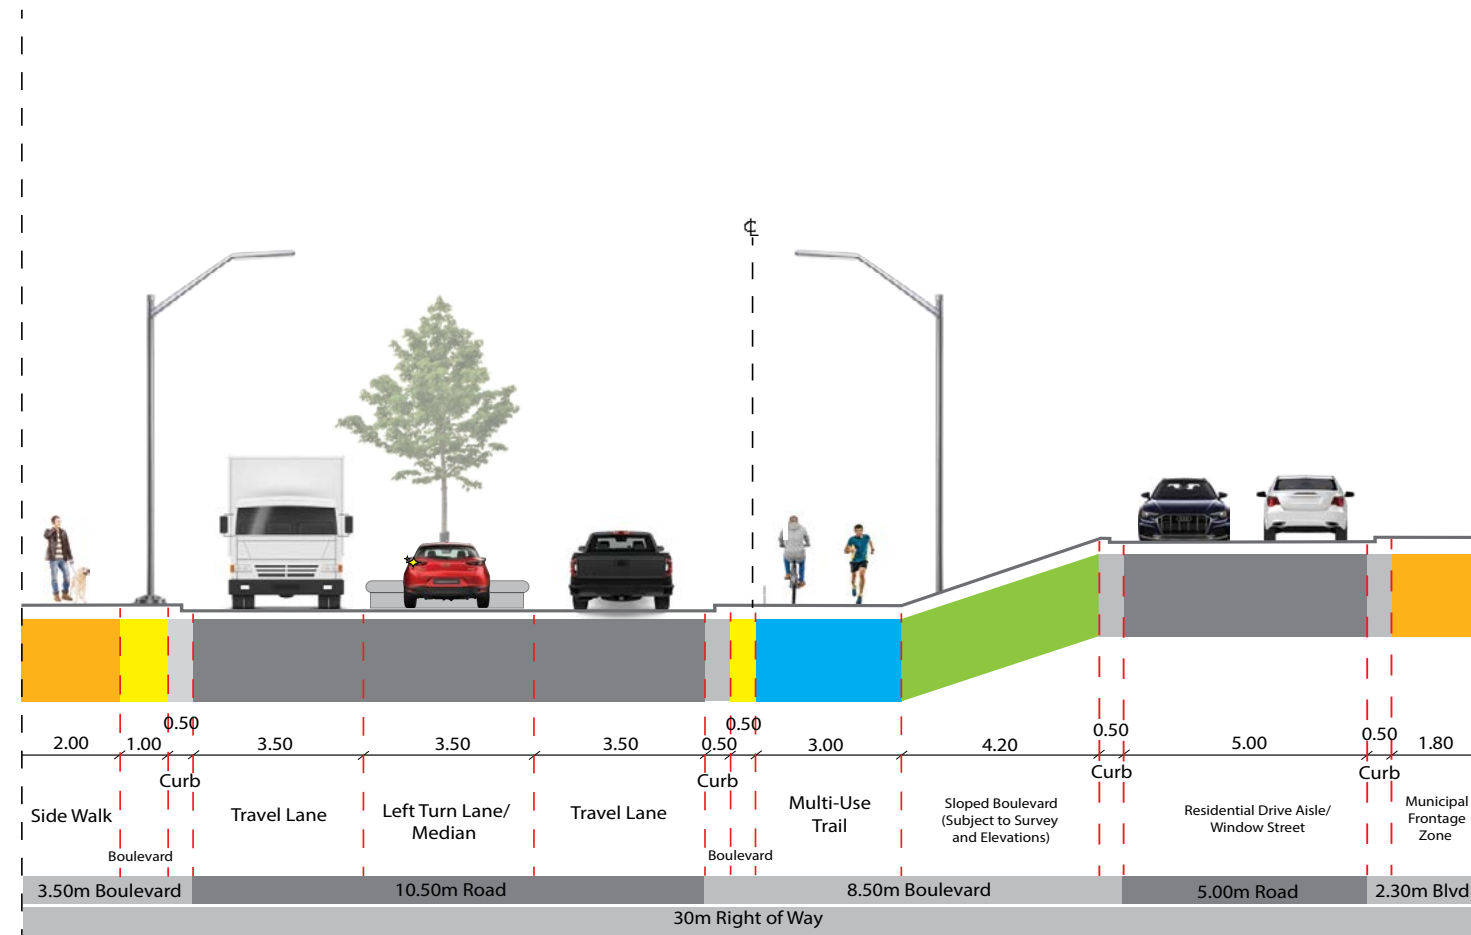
West Broadway Cross Section Between Blind Line and Banting Drive
